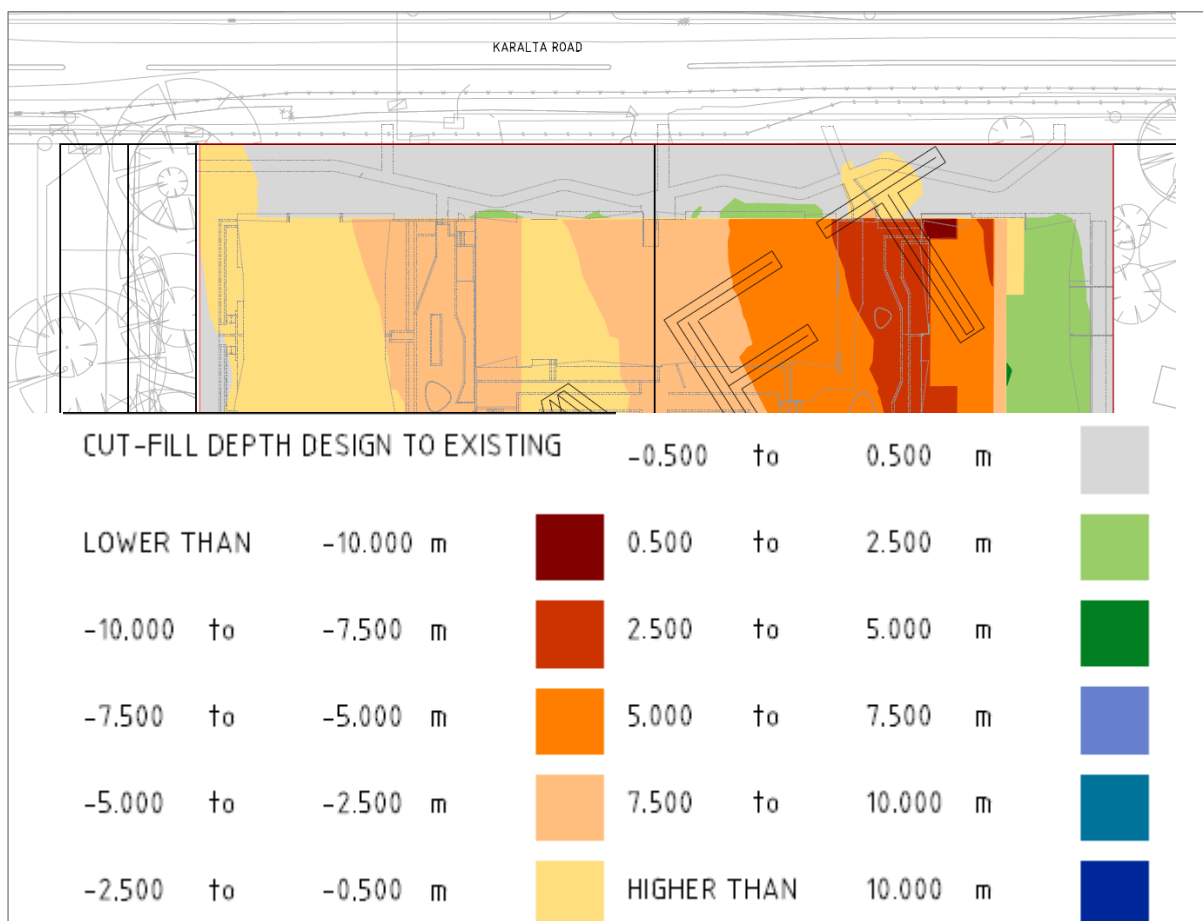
Earthworks Cut & Fill Plan - PS01-C500 Rev D
